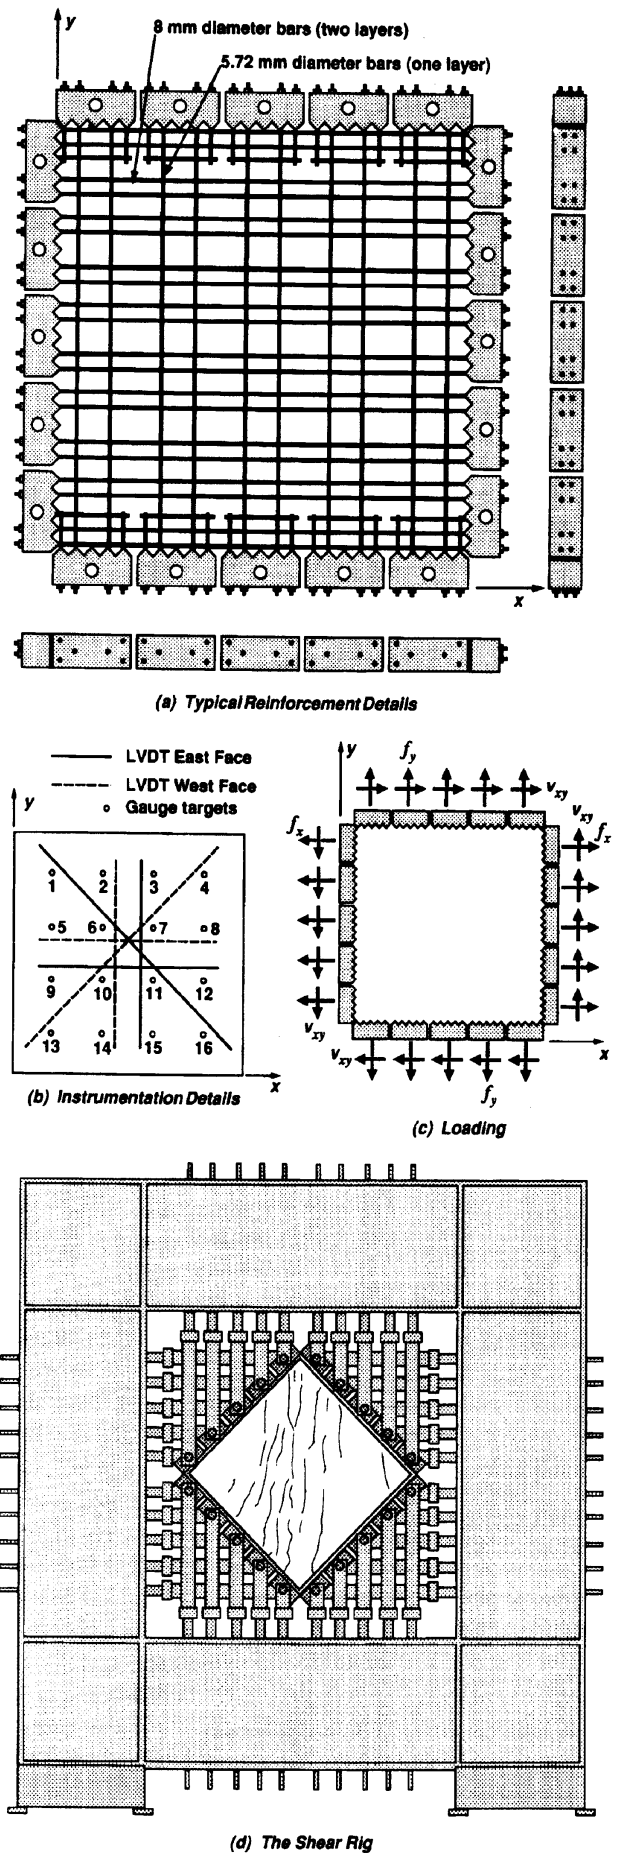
Test specimen details: (a) reinforcement; (b) instrumentation; (c) loading; (d) test rig (25.4 mm = 1 in.)
